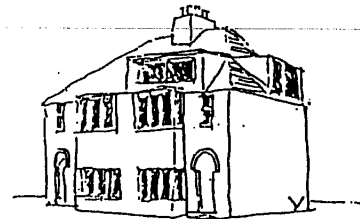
An extension should not either in itself, or if repeated on the adjoining dwelling, result in the visual linking of the dwellings in such a way that an impression of continuous building results which would be detrimental to the street scene.
